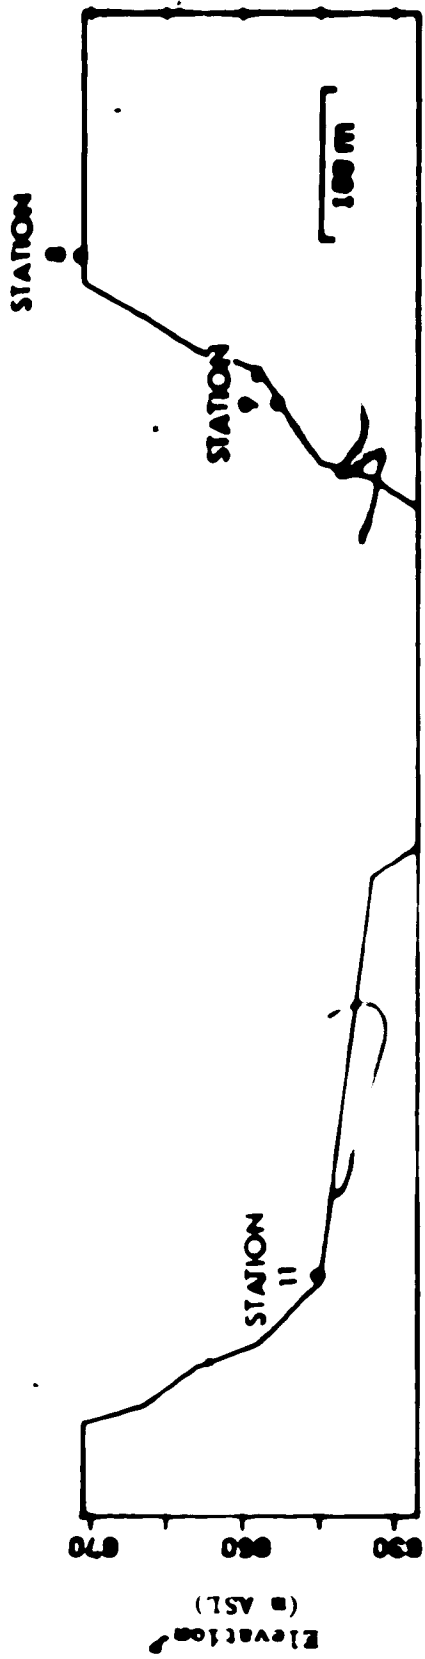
North Saskatchewan River Valley Cross-section at the Lawson Bridge Site
